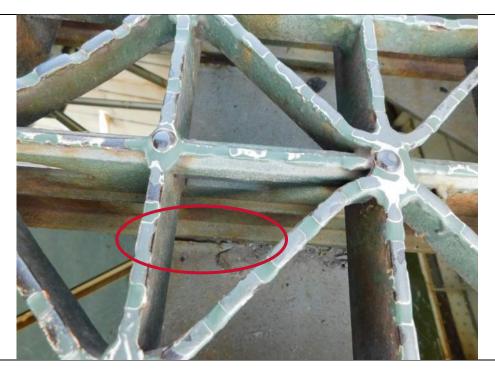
[Span 5] -Detail view of grid deck with broken weld connecting lower main bar to stringer top flange, South leaf in SB lanes near Pier 4, Looking North
